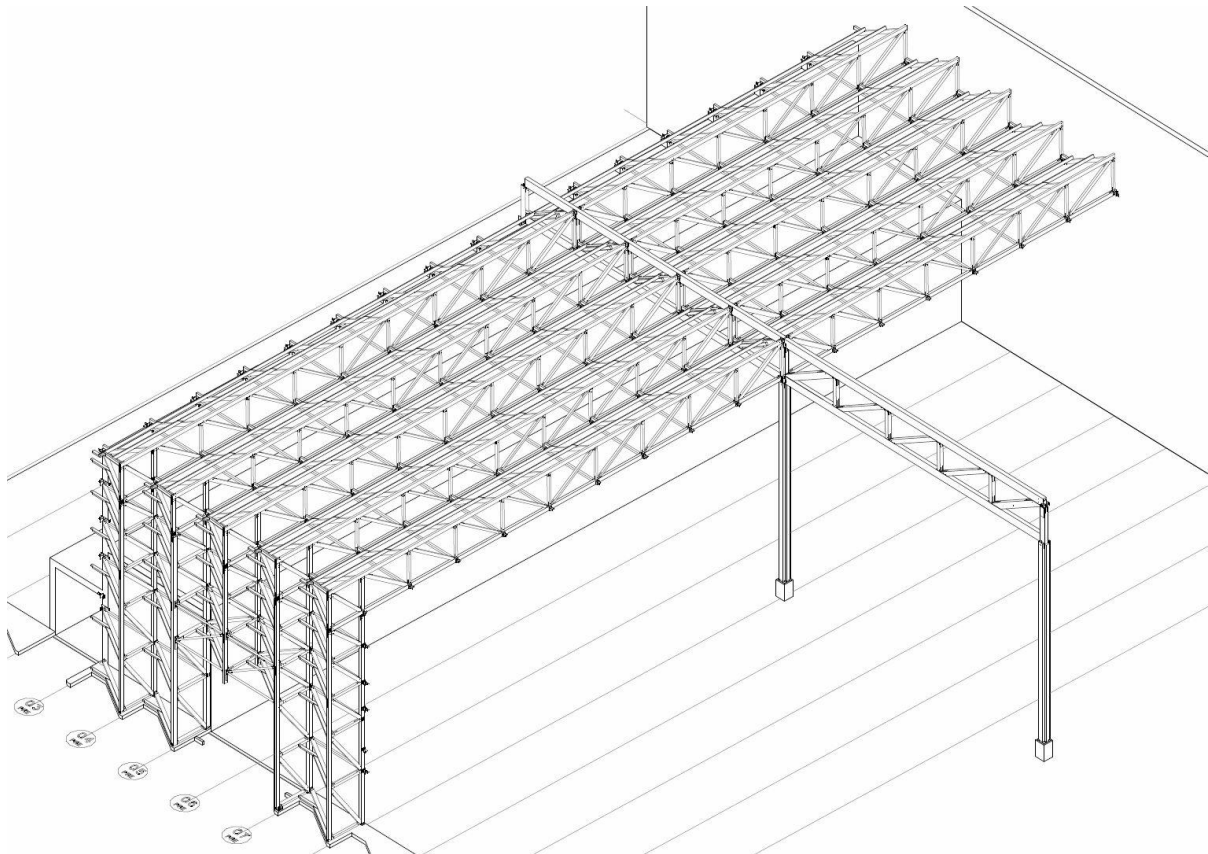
Axonometry – Intermediate posts, Main trusses, Long-span and Façade trusses
